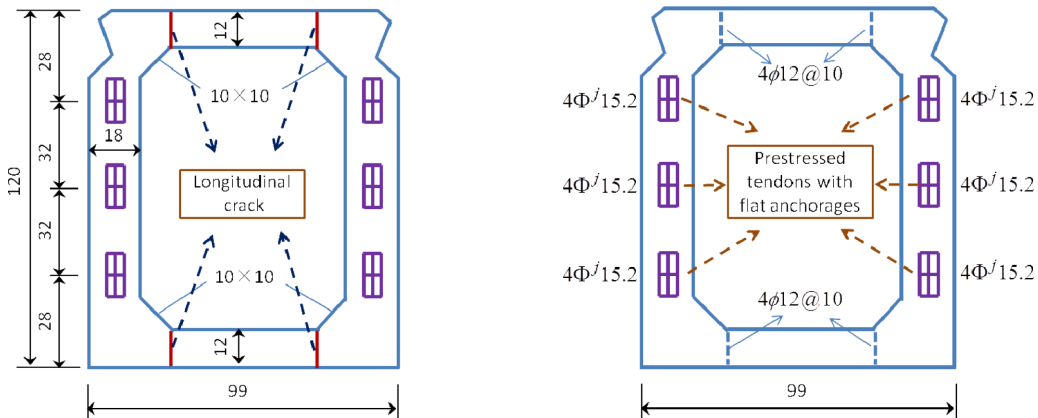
Anchor end section of void slab girders in Jinhua National road bridges (unit: cm)
